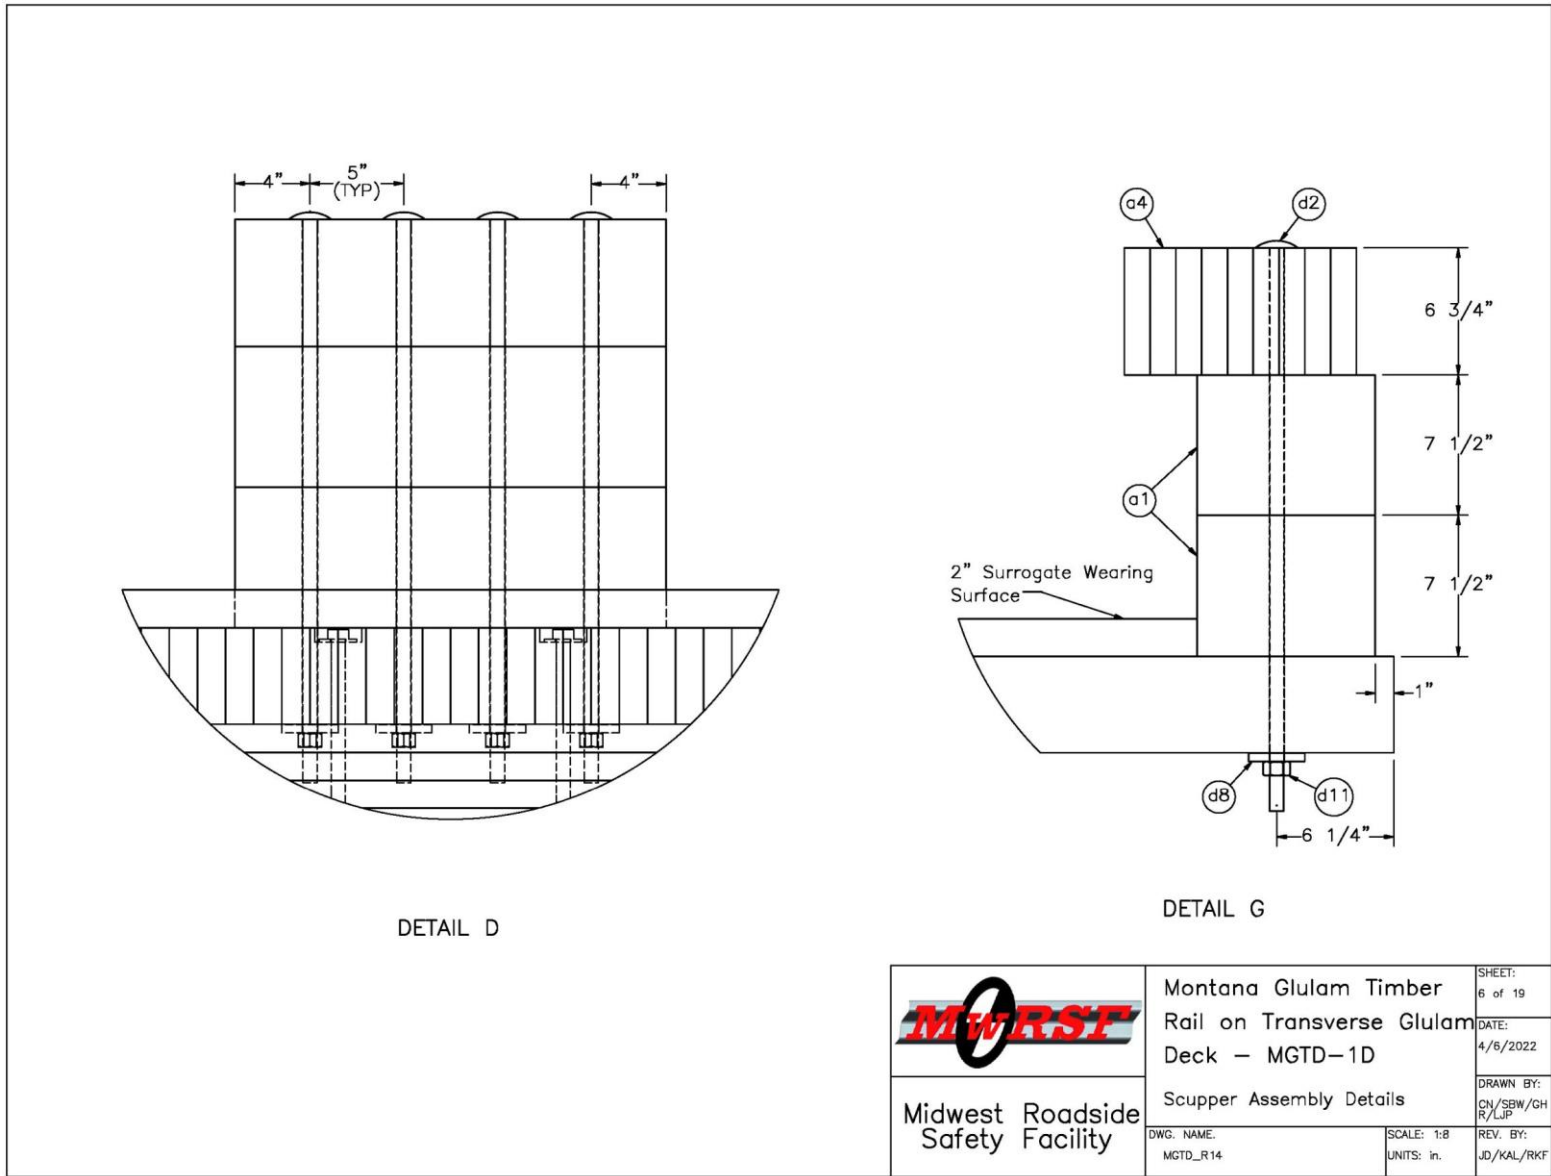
Scupper Assembly Details, Test No. MGTD-1D
